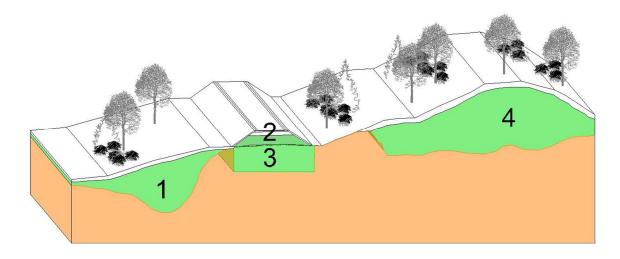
Filling carried out with the use of stabilized poor quality, surplus soil in green areas development projects and landscaping: 1) landscaping filling, 2) filling of a path embankment, 3) landscape hillocks and 4) subgrade improvement of a path
